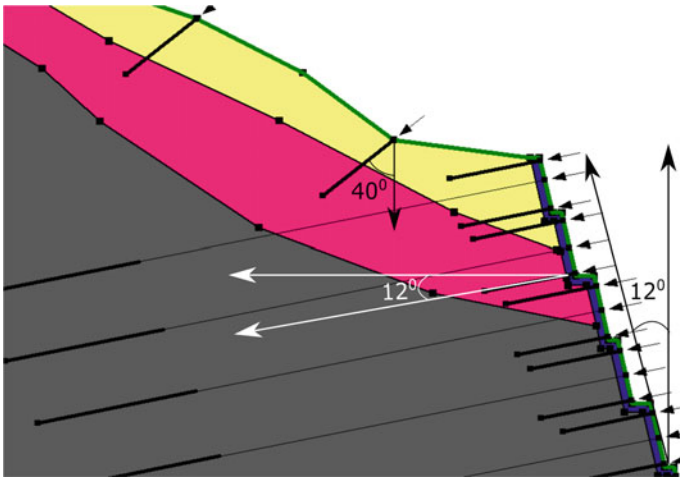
Schematic diagram of a reinforced hill slope in Slope/W
